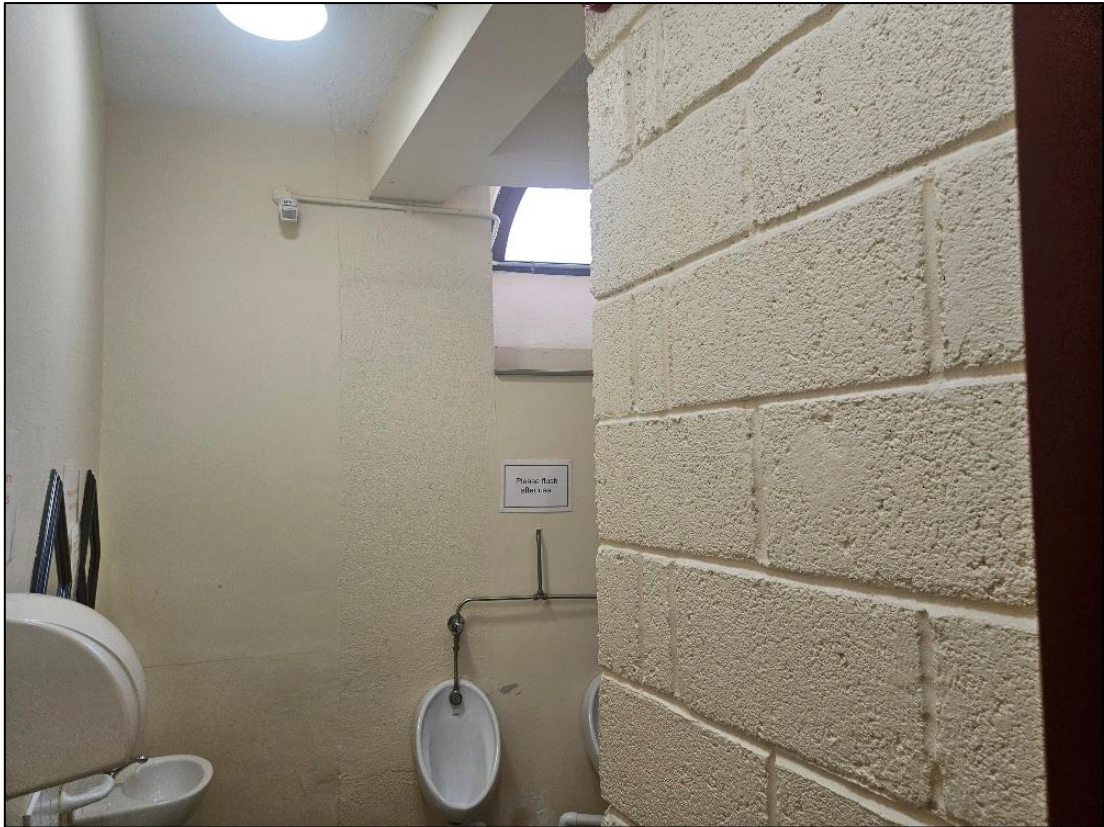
23 at ground floor high level natural light is available to some perimeter rooms
